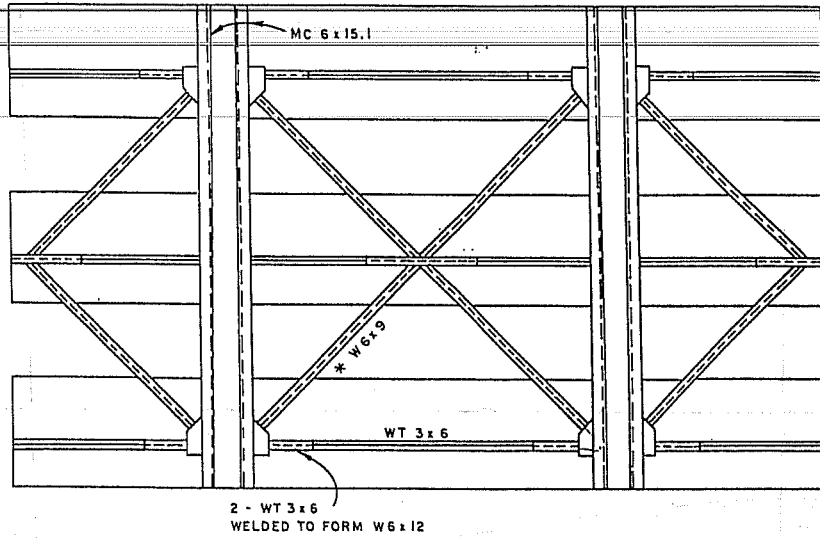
Reinforced Concrete Frame Specimen Retrofitted with Steel CBFs
